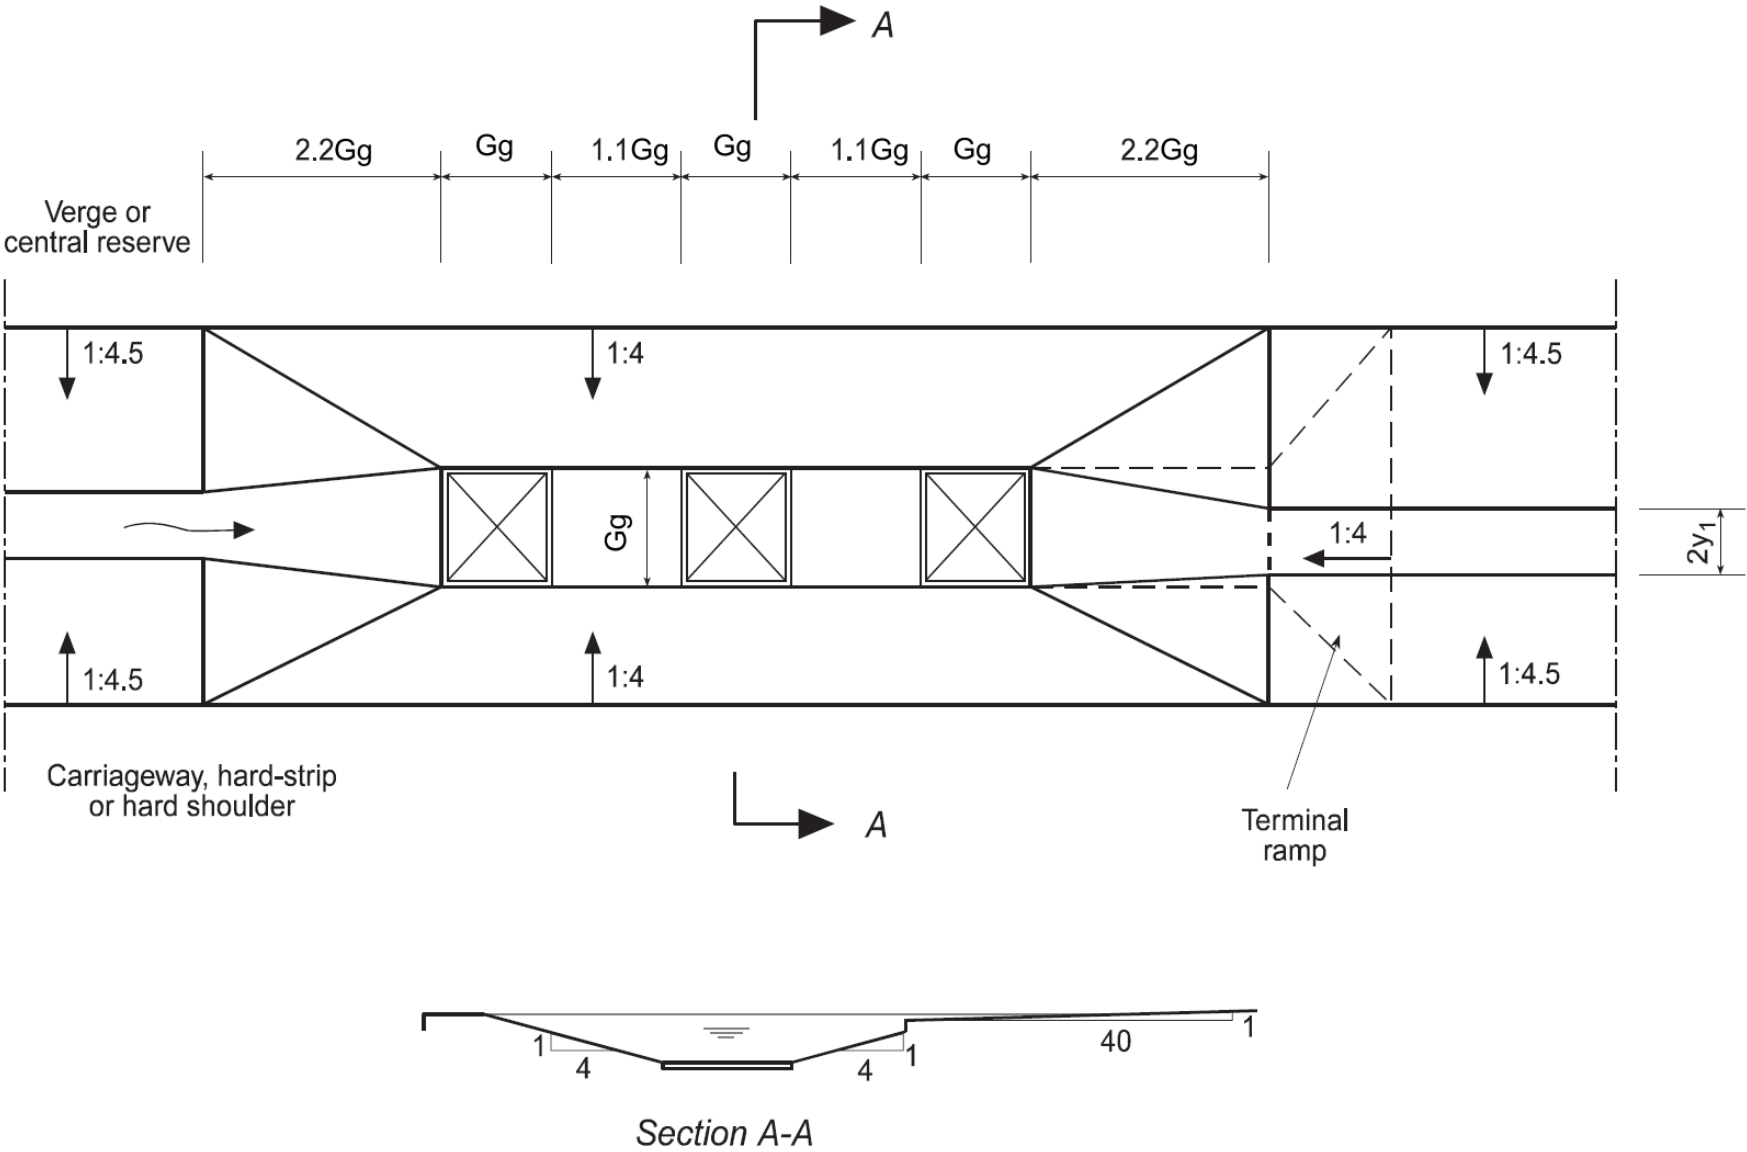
Trapezoidal channel with cross-falls of 1:4.5 - off-line outlet
